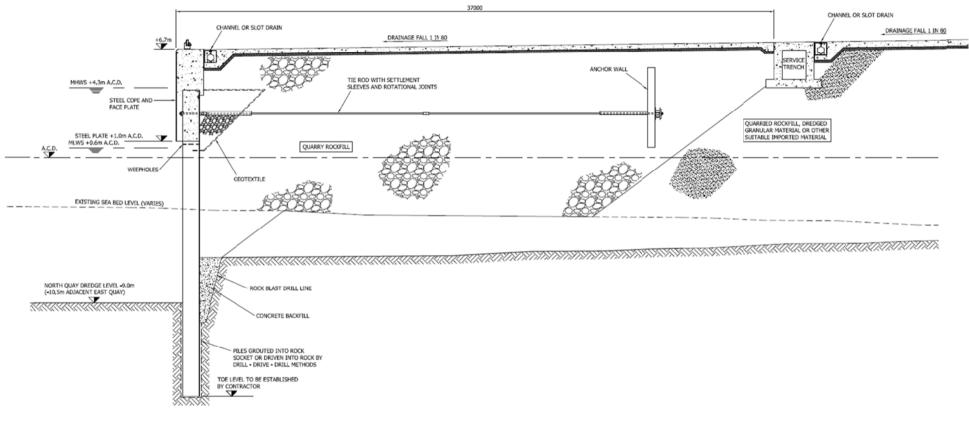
Illustrative cross-section and elevation of a typical section of an open quay - North Quay
